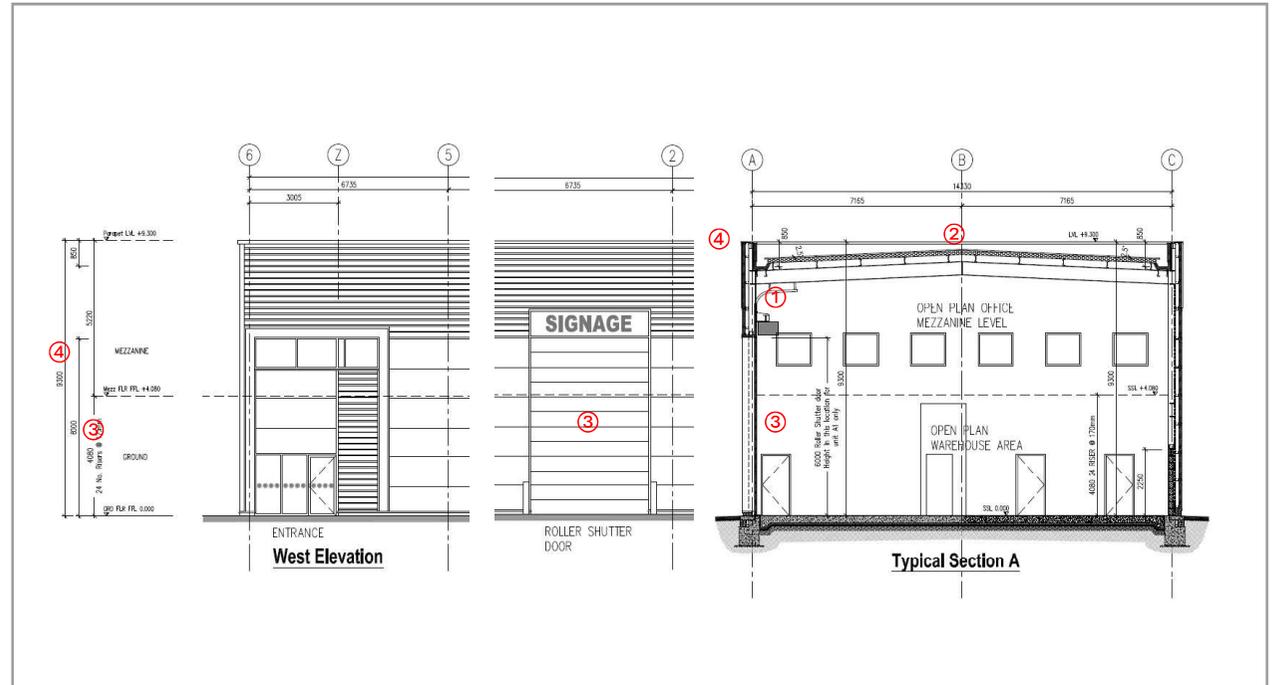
Building heights (extract from Drg. No. 122016 P102 - P03)
